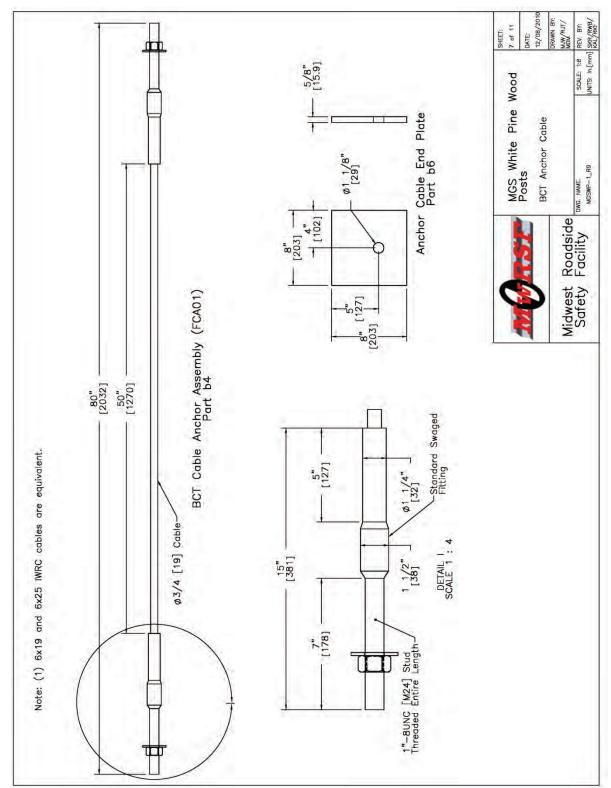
BCT Anchor Cable Details, Test No. MGSWP-1
